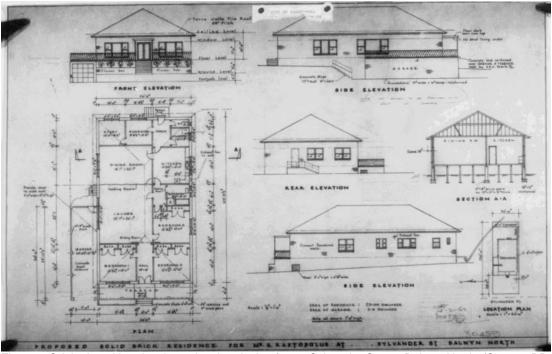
Original working drawings showing design for 69 Sylvander Street, Balwyn North. (Source: BP 30459)
